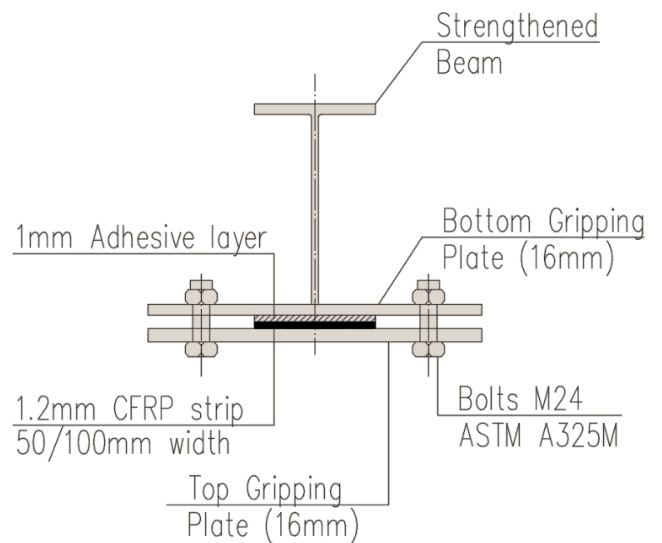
Cross section of the steel beam, adhesive, CFRP strip and the grip plates
